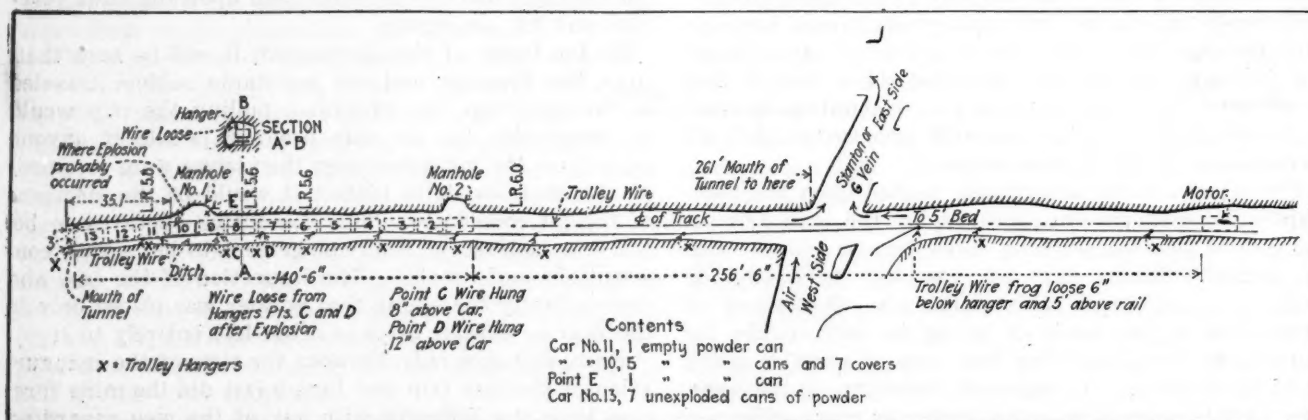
PLAN AND CROSS-SECTION OF THE BALTIMORE TUNNEL, VIEWED FROM THE INSIDE LOOKING OUT
